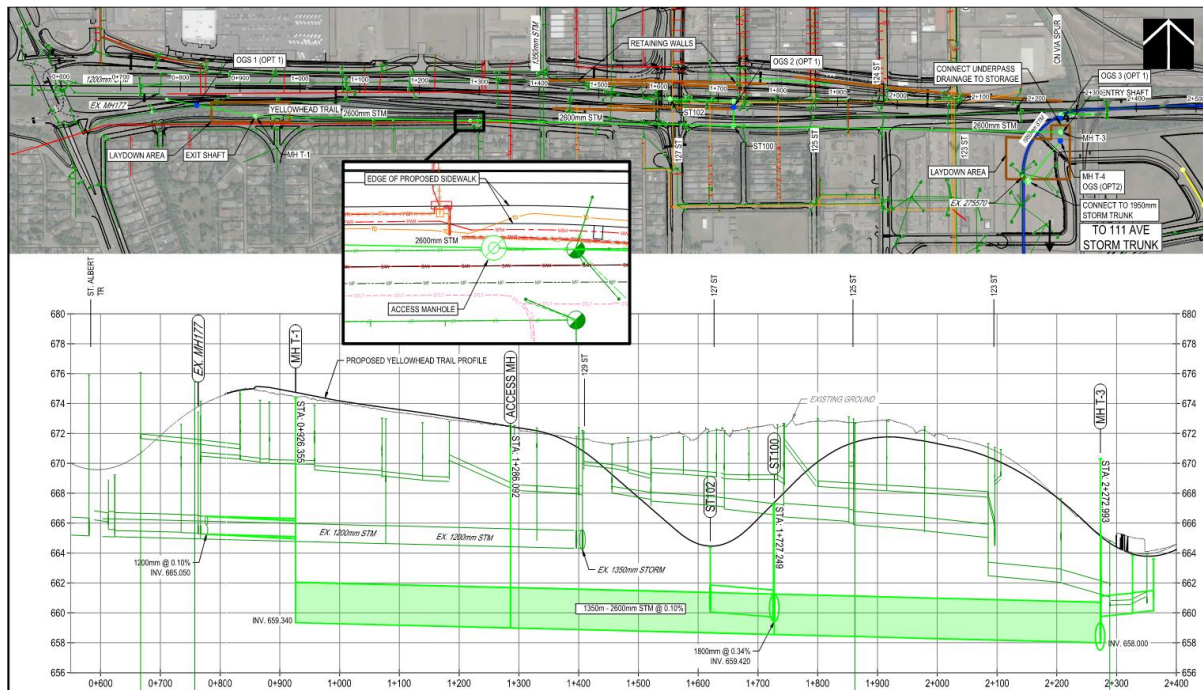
Plan/Profile of Proposed Conveyance/Storage Tunnel
